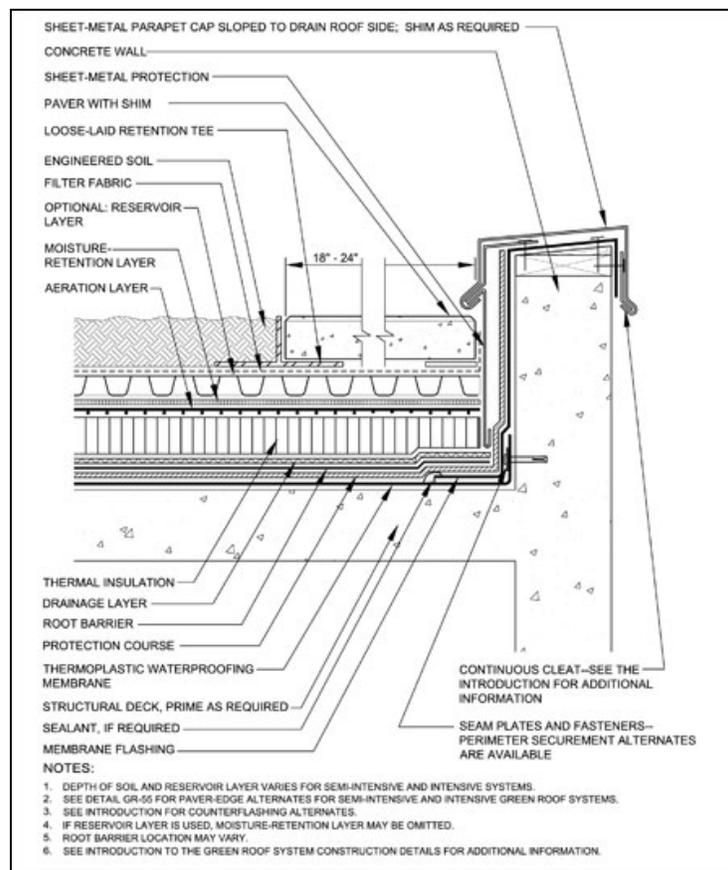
Green roof detail (<http://www.professionalroofing.net/>).
